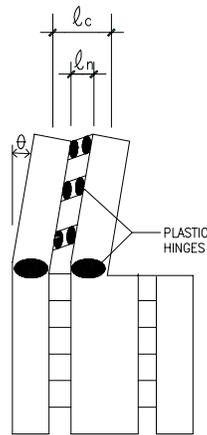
Mechanism with plastic hinges at 4th floor wall piers
